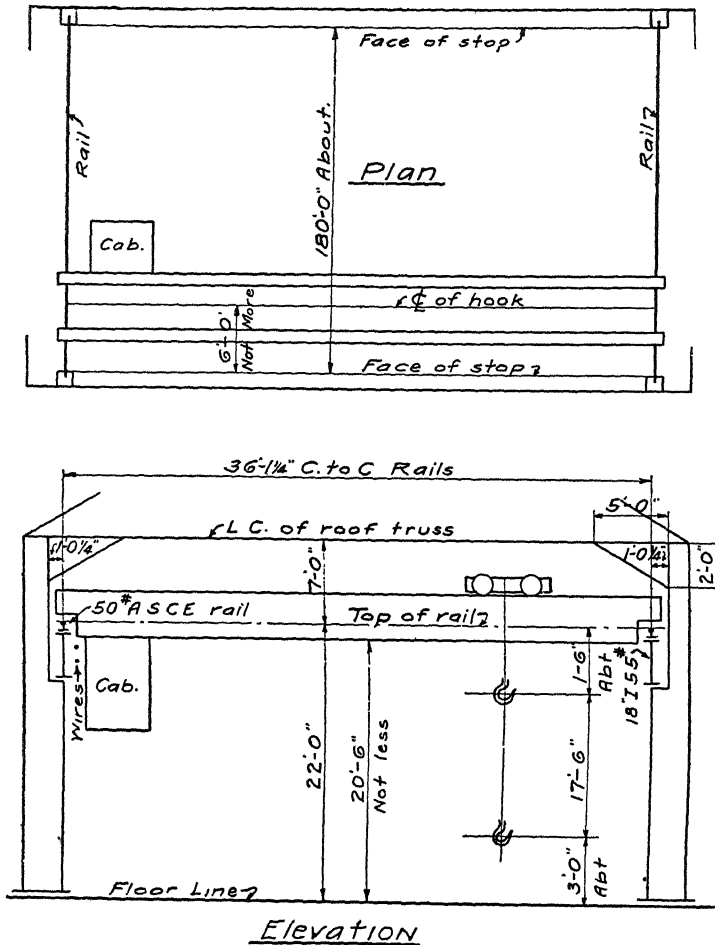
Typical dimension sheet for E. O. T. Crane.
